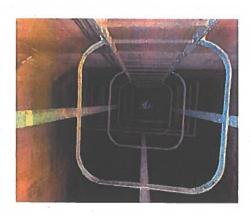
Pevensey Central Outfall - Outer chamber. South Sub-Chamber (Beach side). Existing access arrangement.
